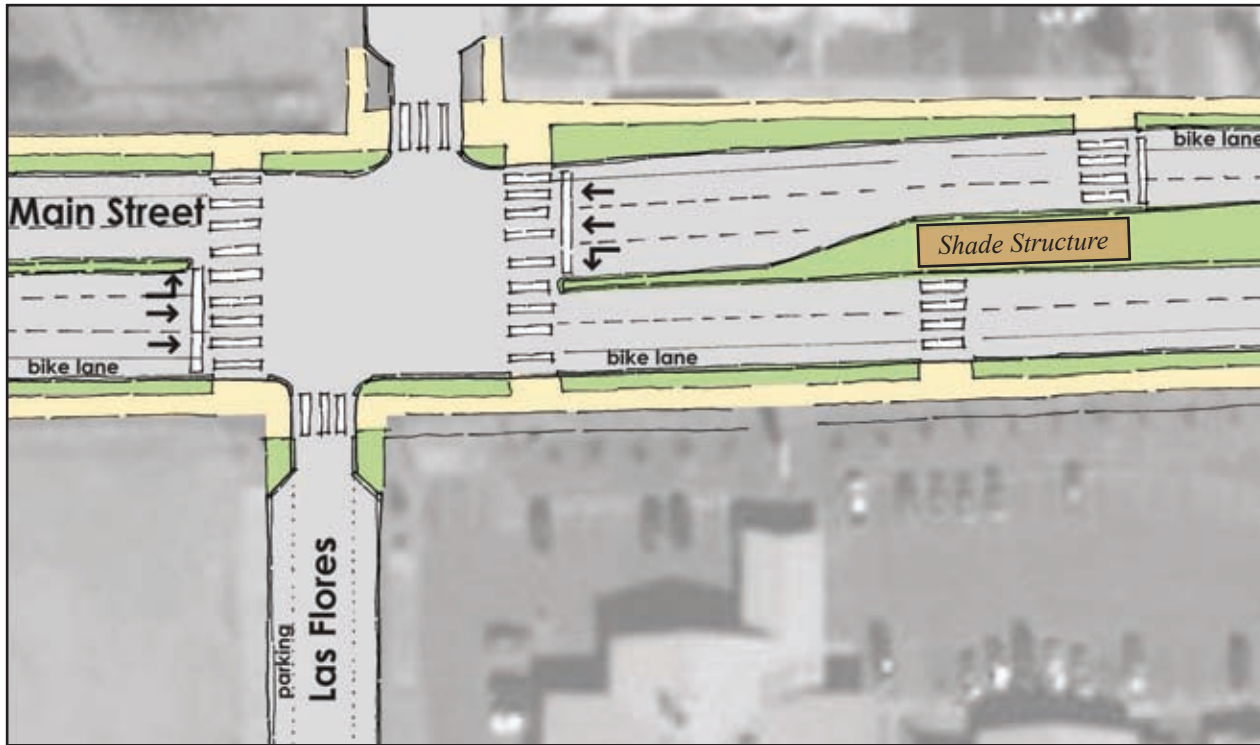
Short-term recommendation for Las Flores Drive intersection.
